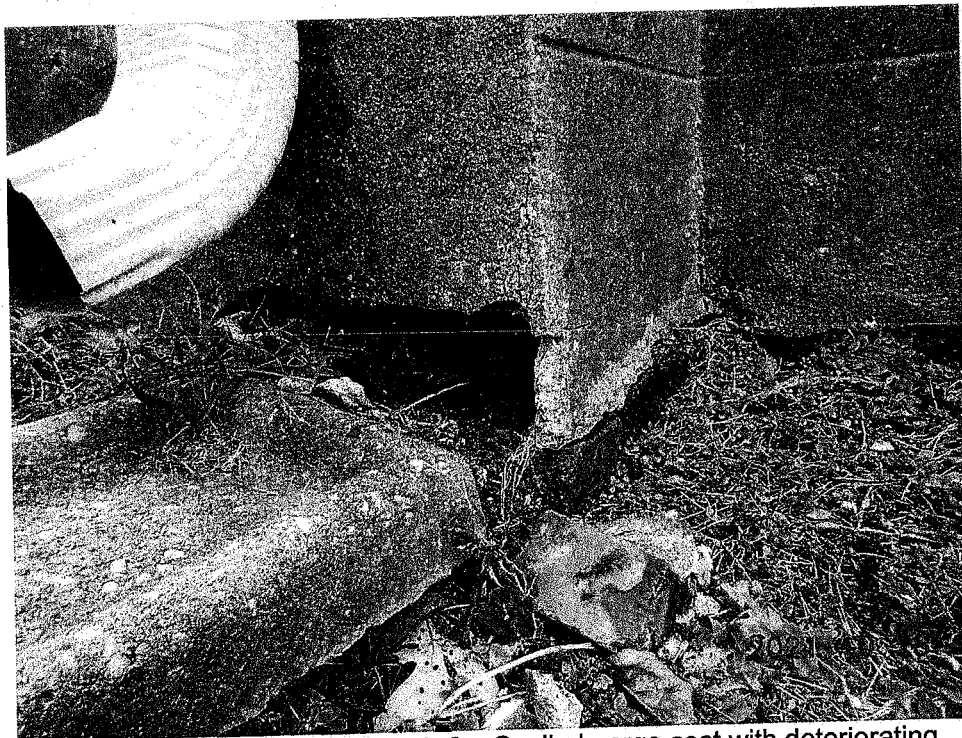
Routine Repair 2 – Spalled parge coat with deteriorating brick masonry foundation wall – East Elevation, Grid C: Ht. 0' +/-
